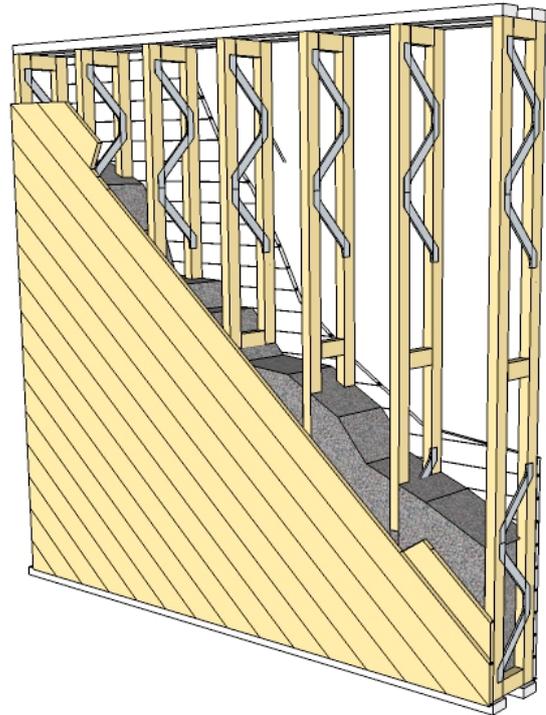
Typical engineered web beam as vertical structural elements in wall cassette
